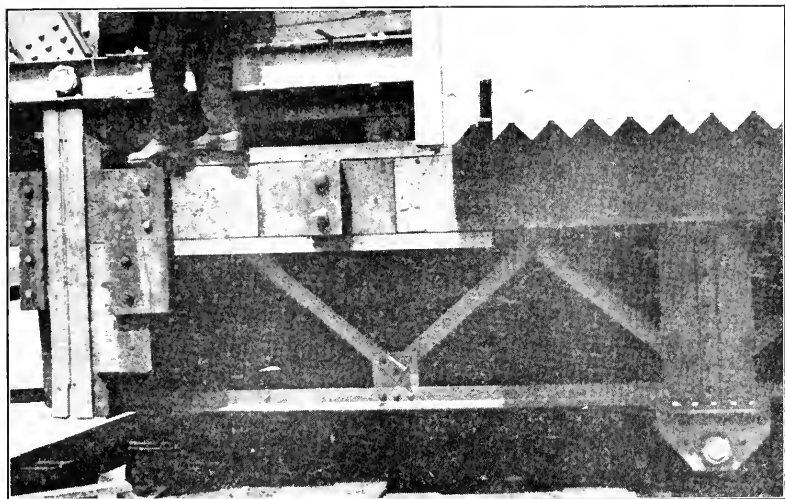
TEMPORARY BOTTOM CHORD IN PIVOT PANEL OF SOUTH TRUSS.
